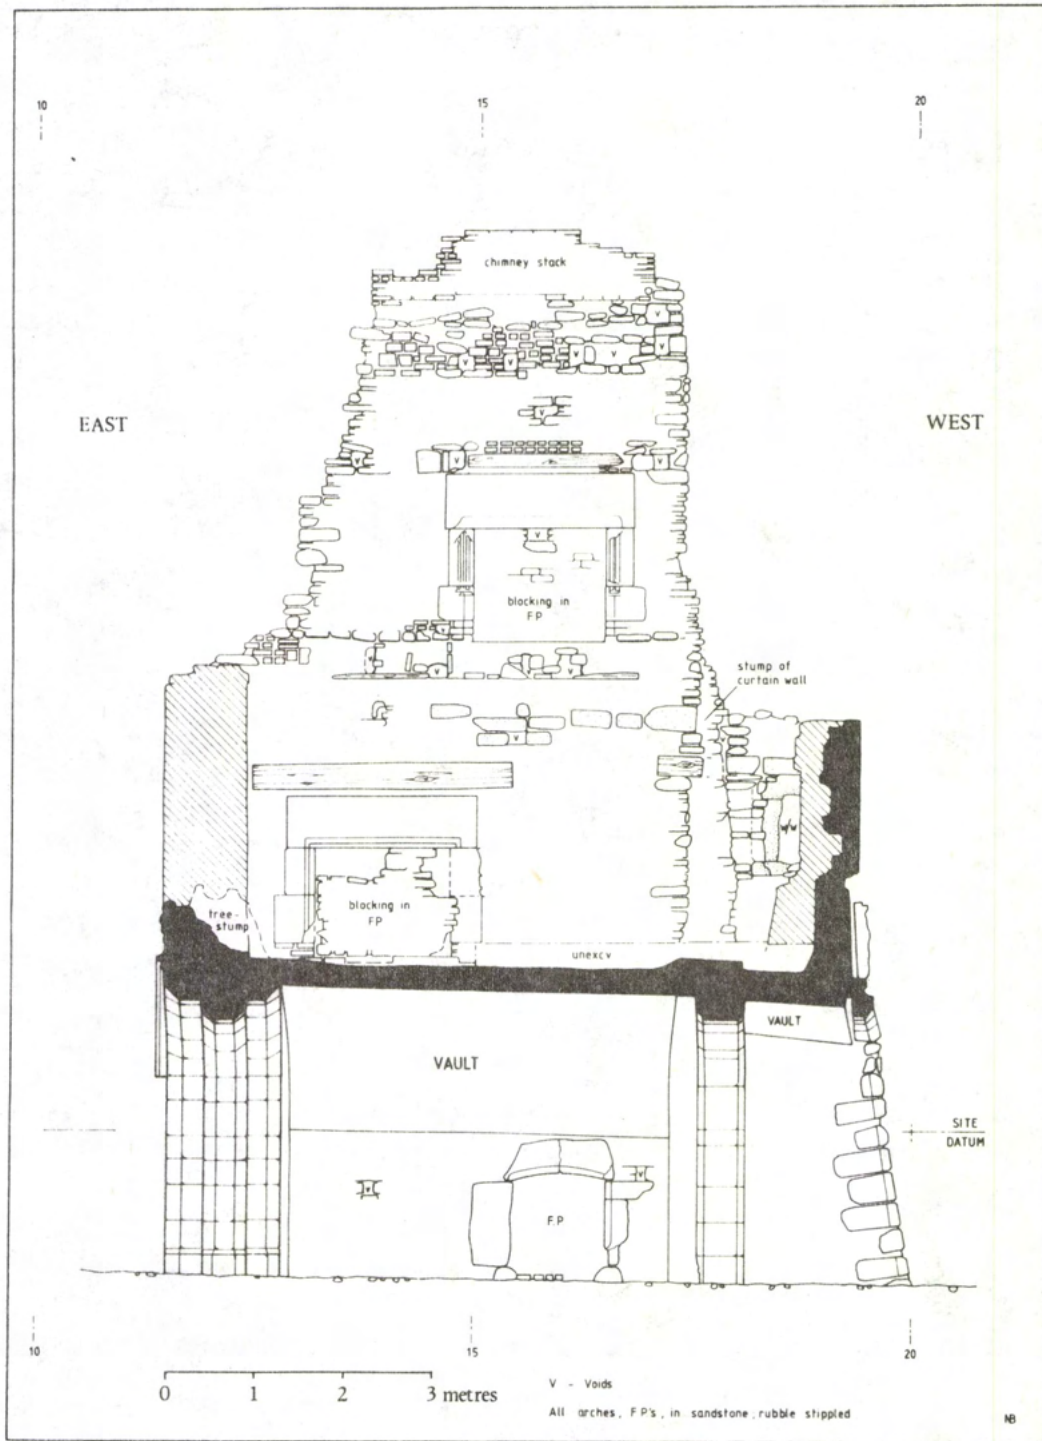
WALSALL, Rushall Gatehouse: South elevation and axial section (Baker)
